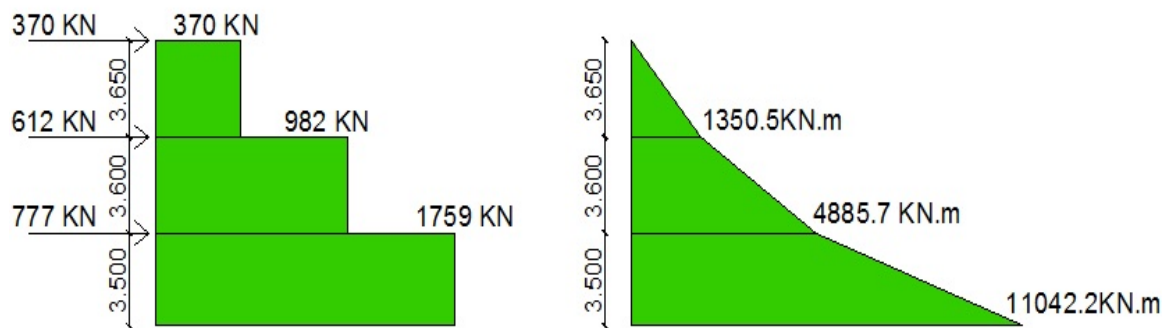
Moment and Shear diagram for shear wall (SW3)
